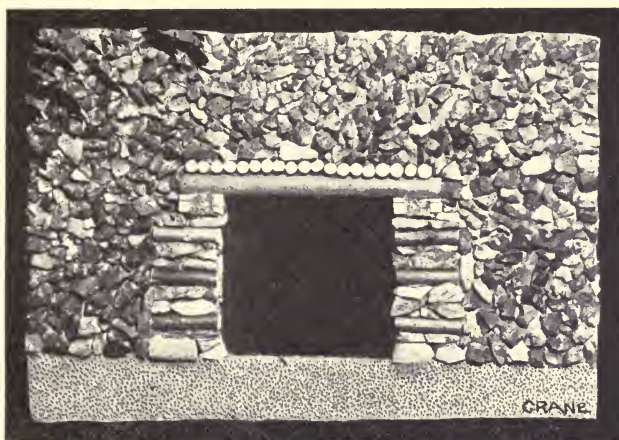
Passage Formed on Levels by 'Rock-Walls,' Showing Use of Waste Rock and Logs in Their Construction, and the 'Wall-Pieces' and Lagging Placed on Top of the Walls. (Modeled after Sketch in Eng. and Mining Jour., vol. 97, p. 949.)
